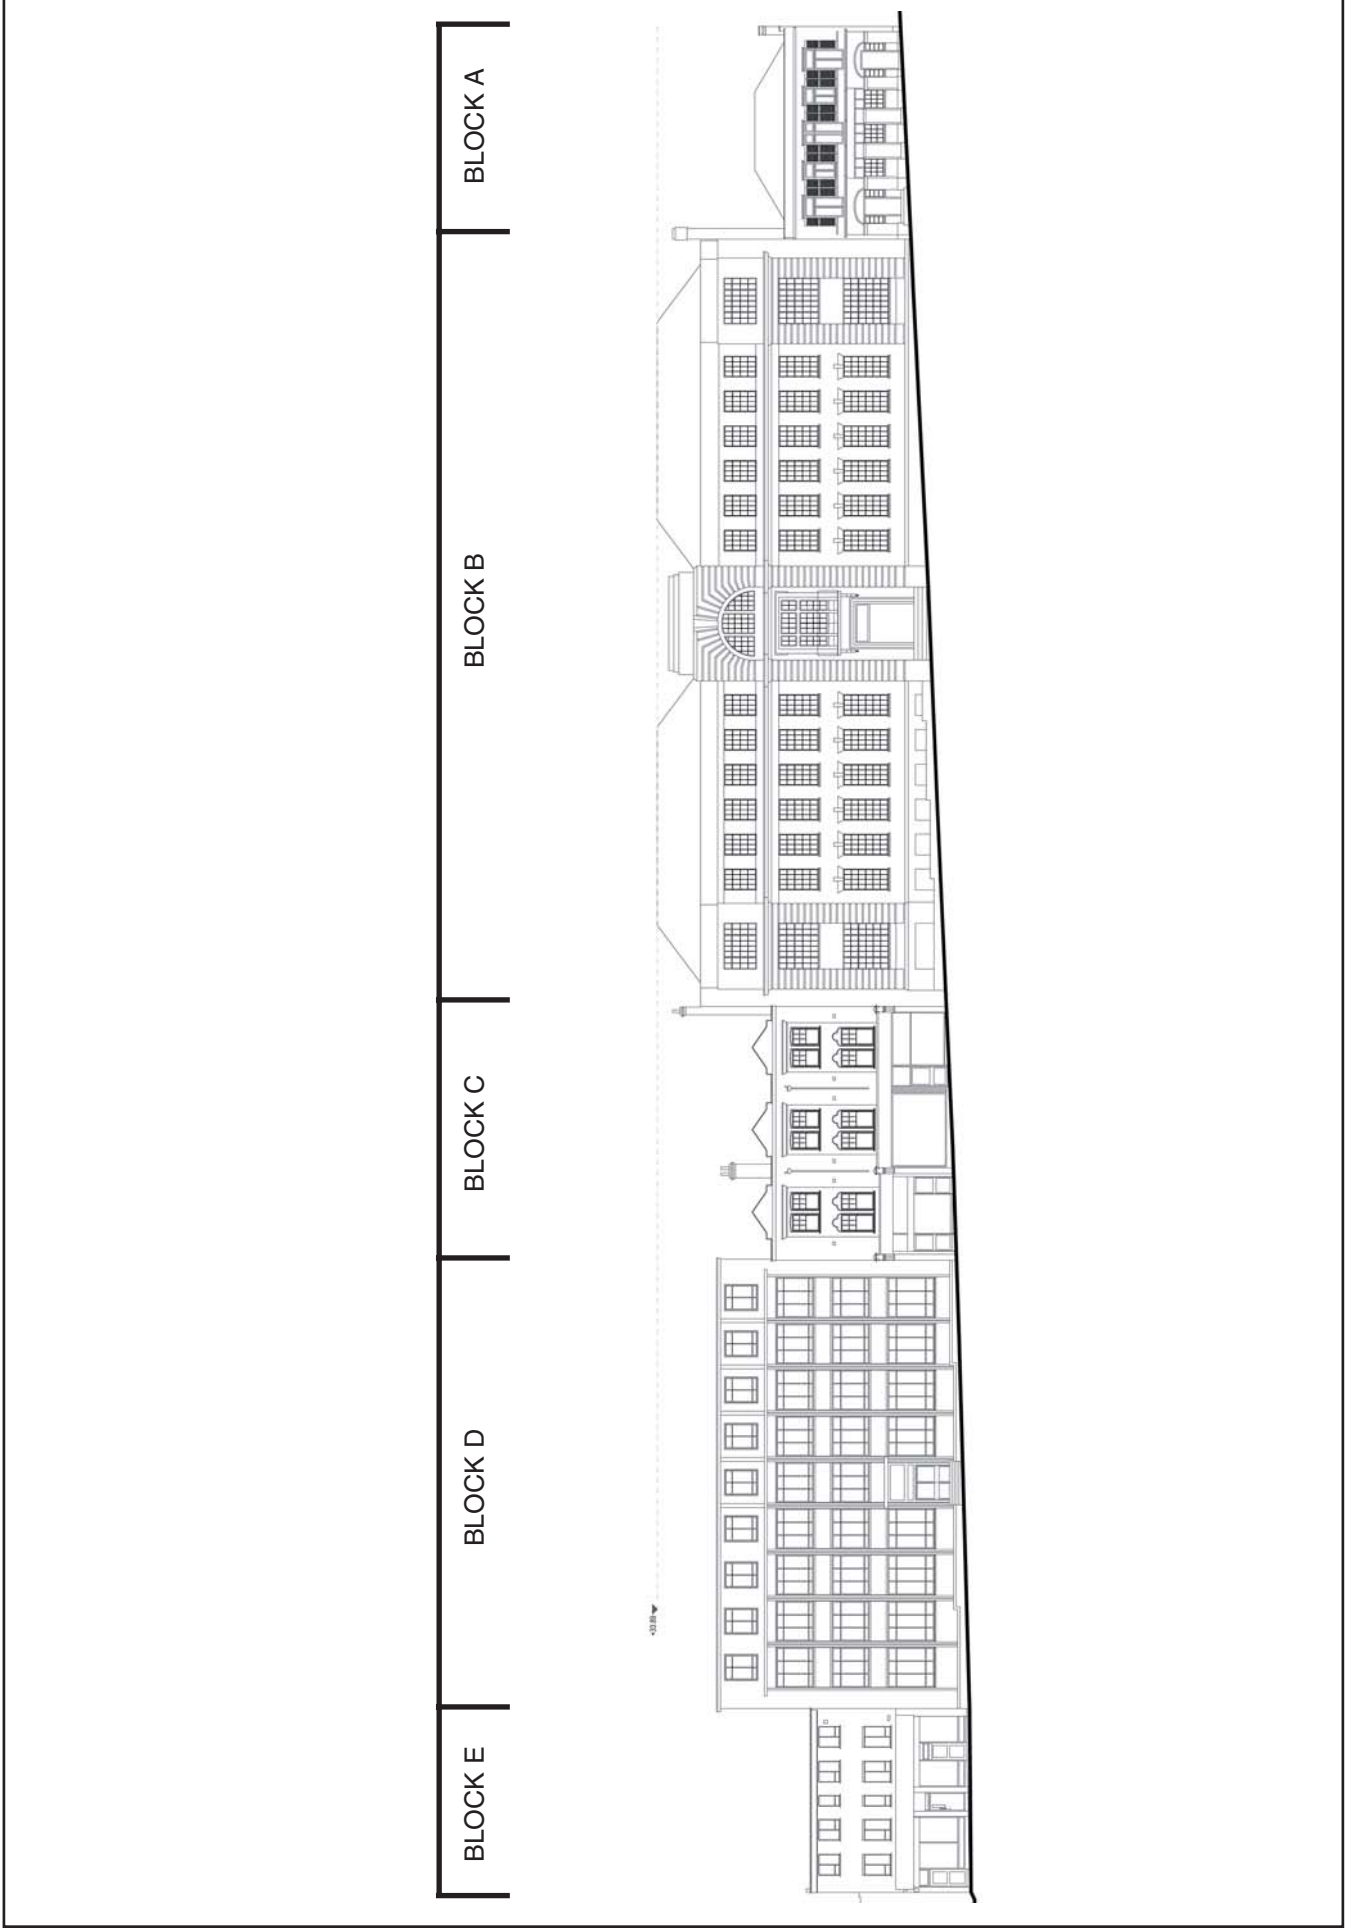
Wellington Street elevation showing buildings recorded (based on survey drawings by HLM Architects)
